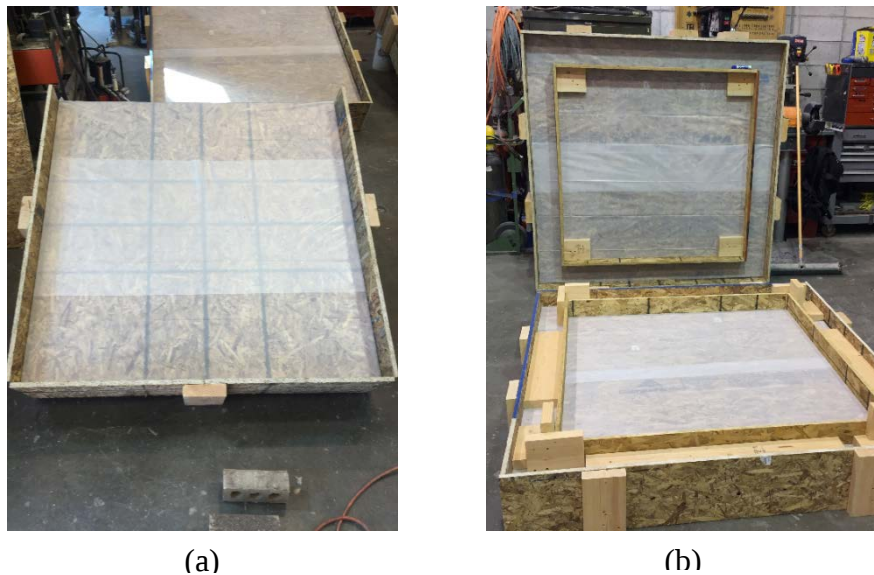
(a) Visqueen pulled tight over the surface of the specimen platform to provide a frictionless surface (b) completed formwork for the masonry infill specimen
